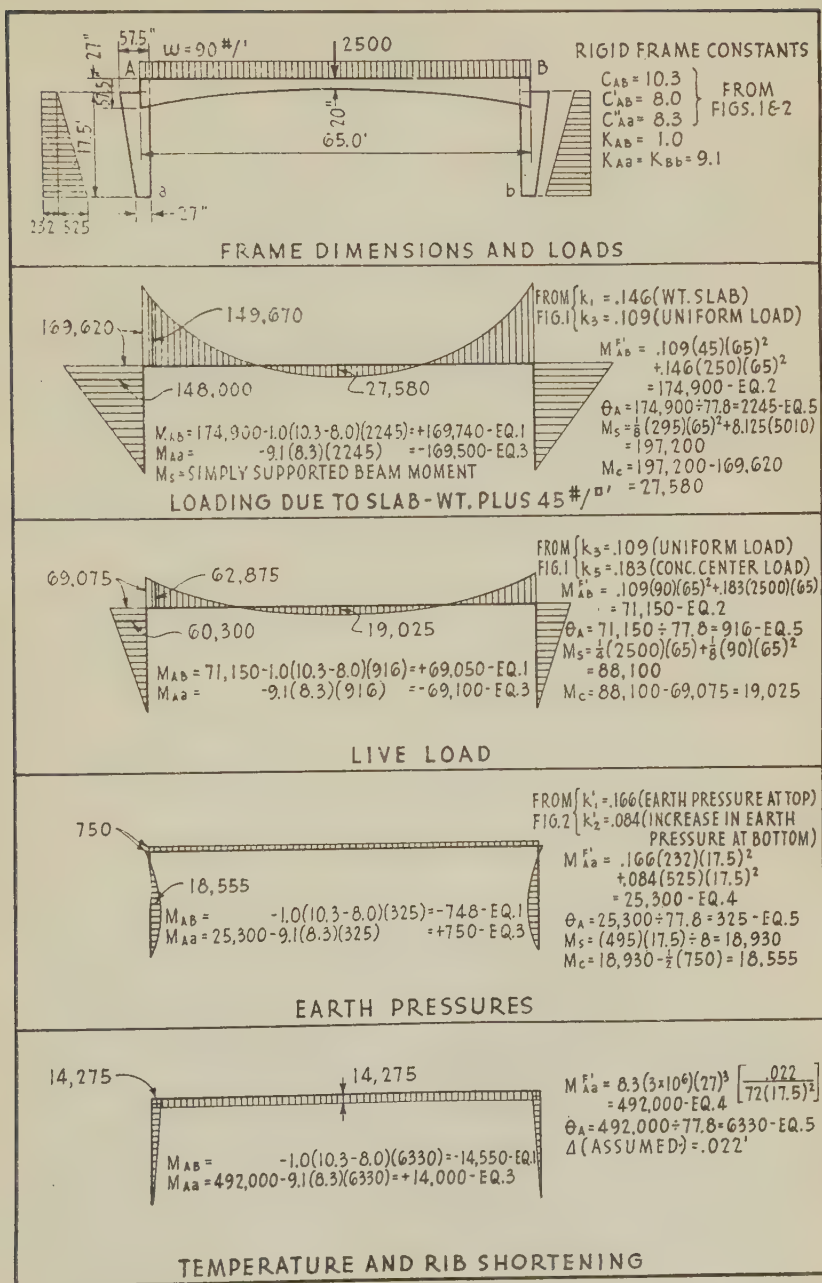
SOLUTION OF SINGLE SPAN RIGID FRAME BRIDGE—
